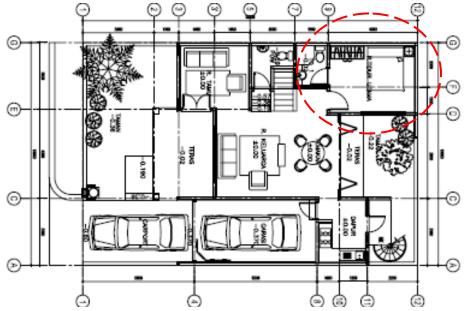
Floor Plan of Ground Floor (Jaya Real Property, PT.Tbk. 2008a)
